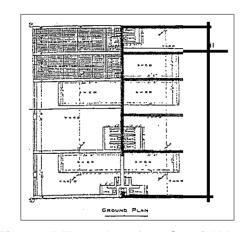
Floor plan of the Special Yards based on an early plan c. 1925.
